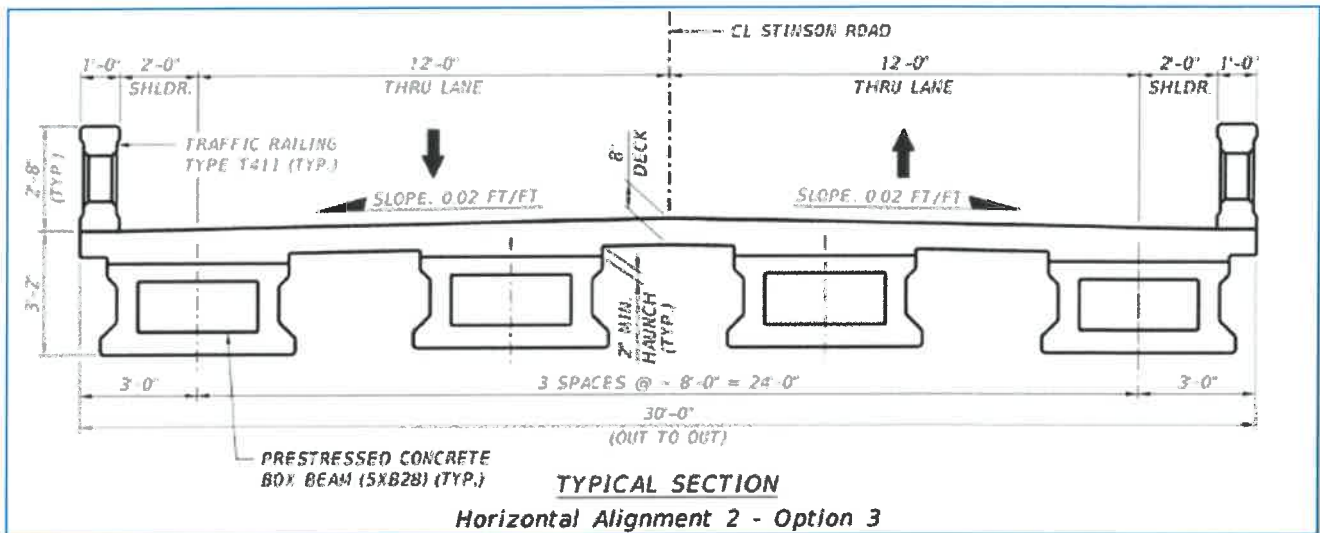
TxDOT Prestressed Concrete XBeams (5XB28) Typical Section
